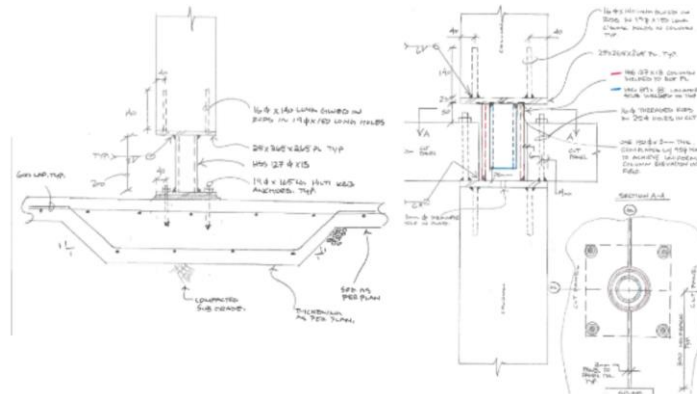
Preliminary structural design hand sketch (Image source: Fast and Epp)
